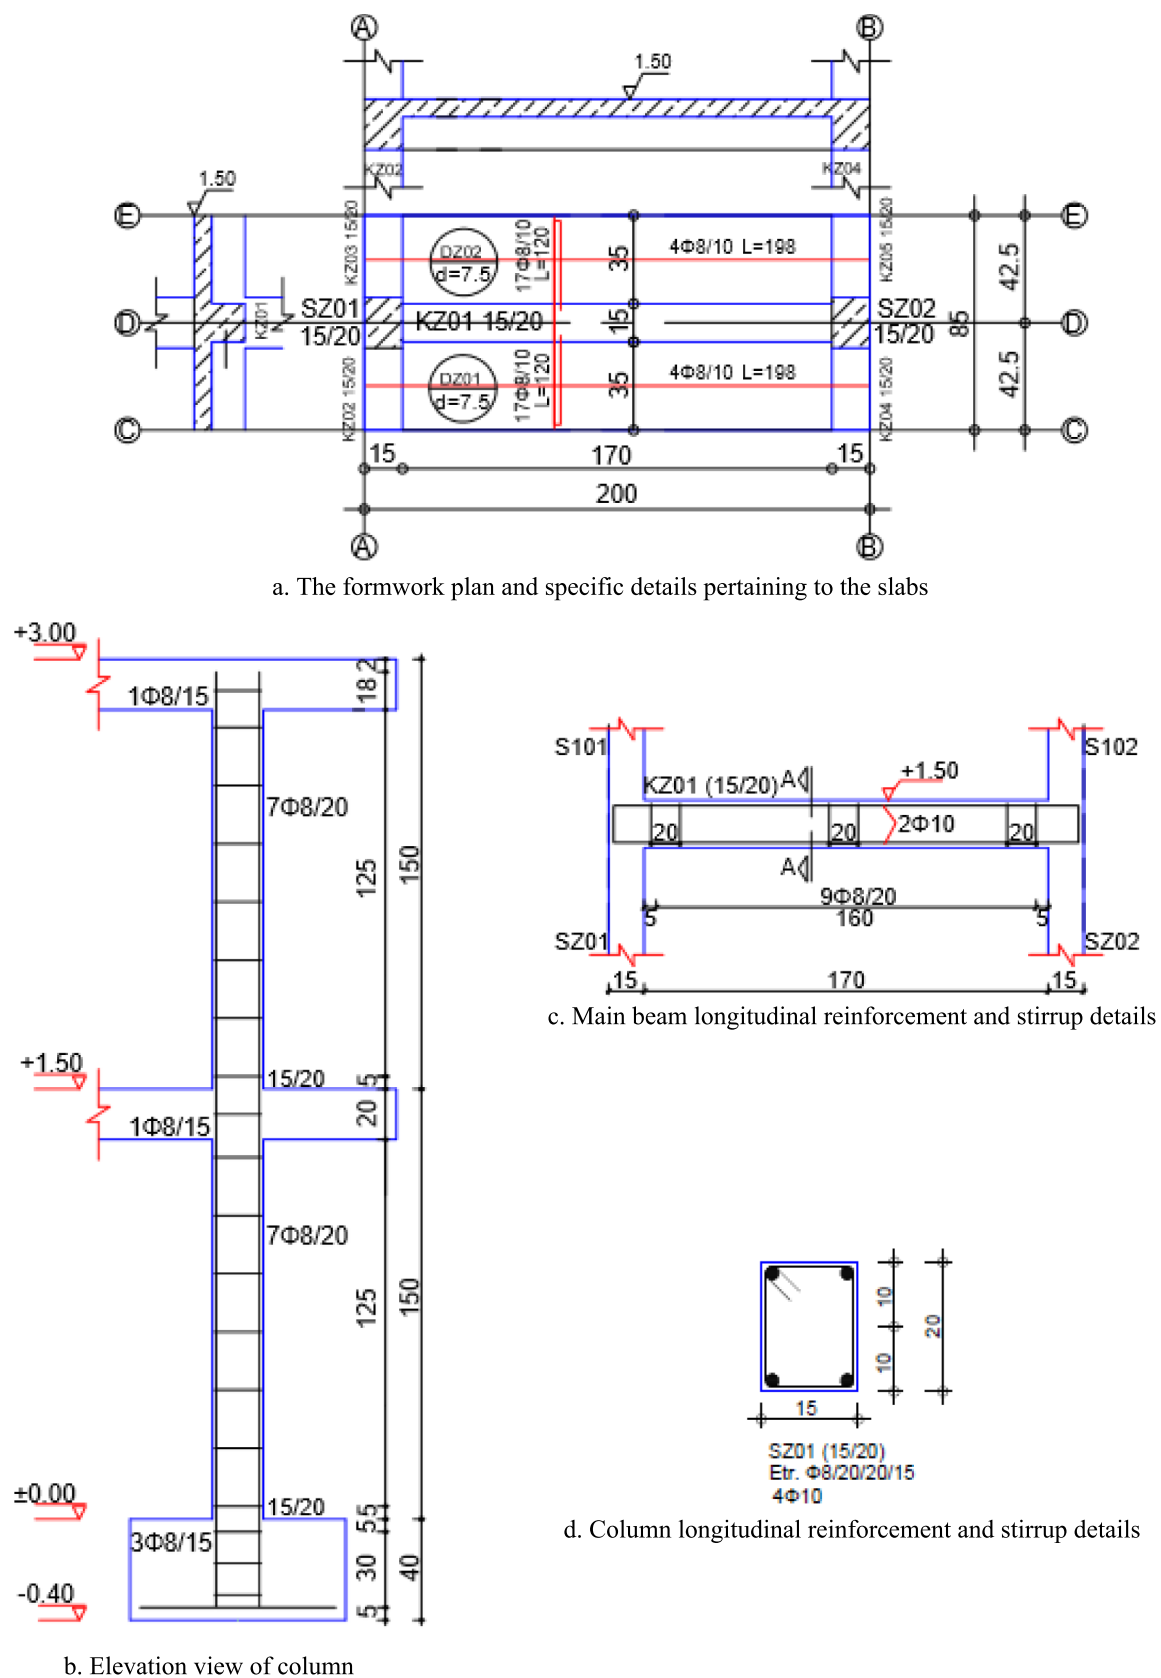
The test specimens' geometric configuration and reinforcement details (dimensions in cm)
